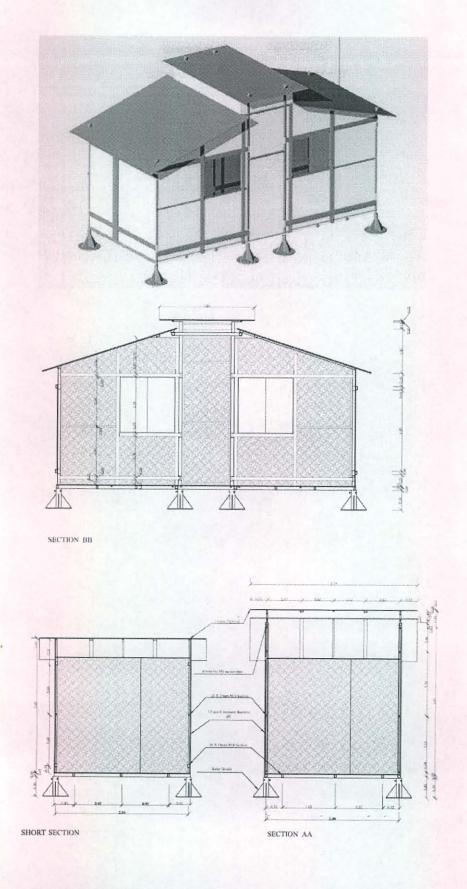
Elevational view details of the modular portable bamboo house made with bamboo ply board.
